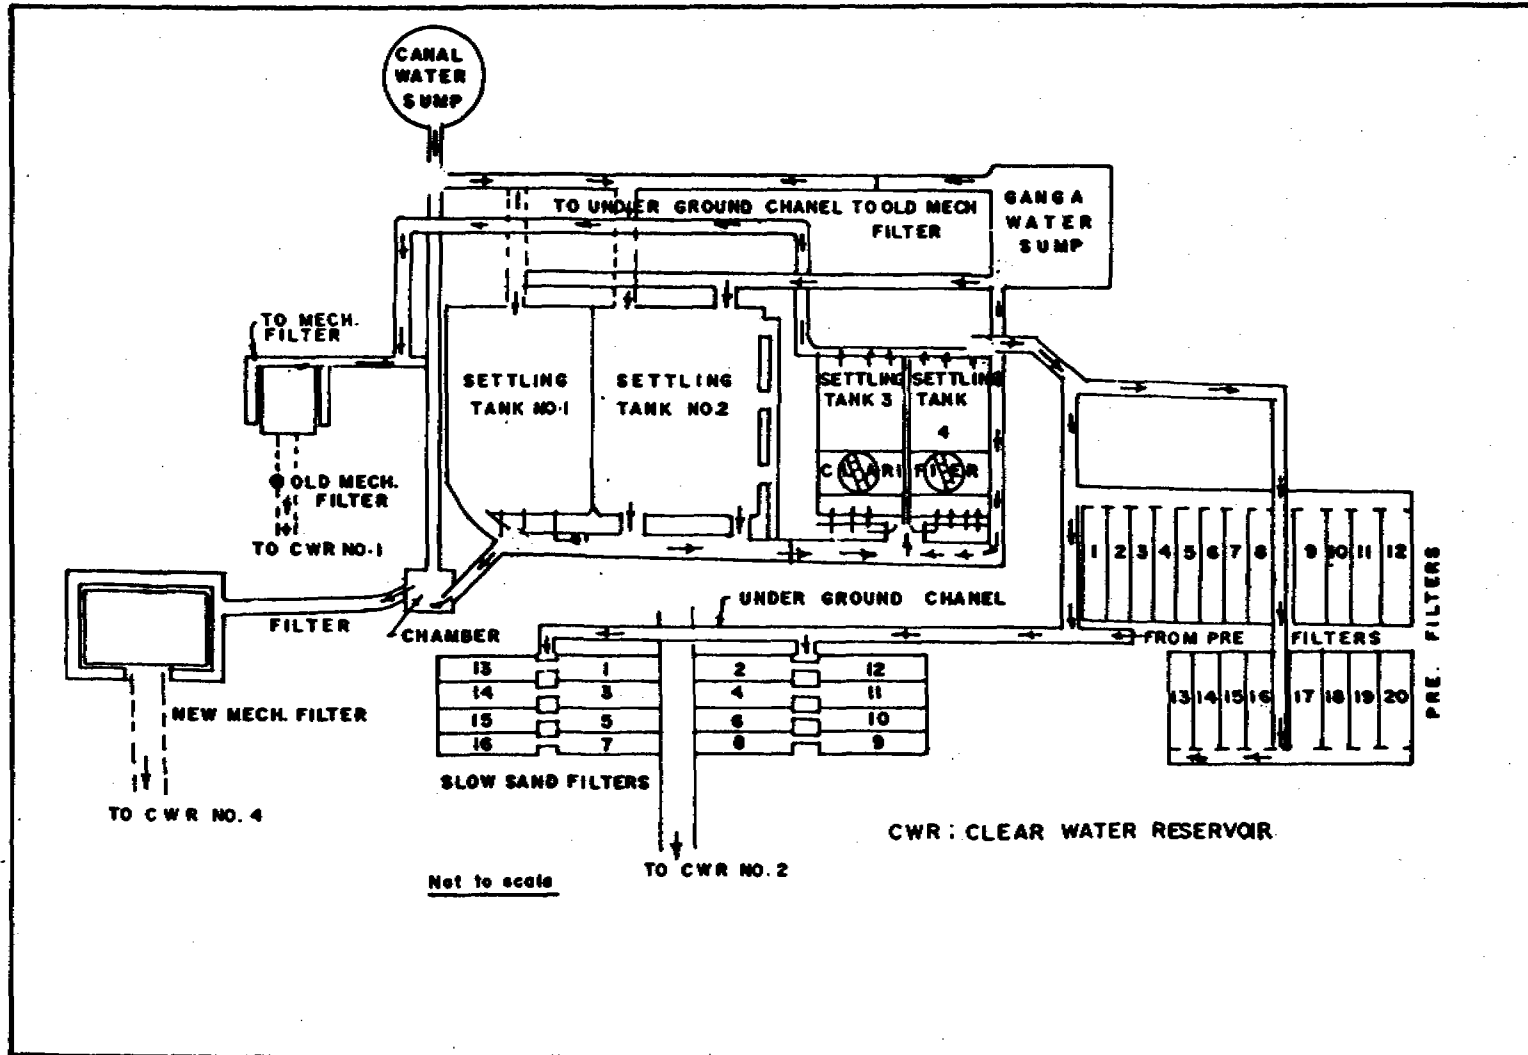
LAYOUT PLAN OF BENAZHABER WATER WORKS, KANPUR
